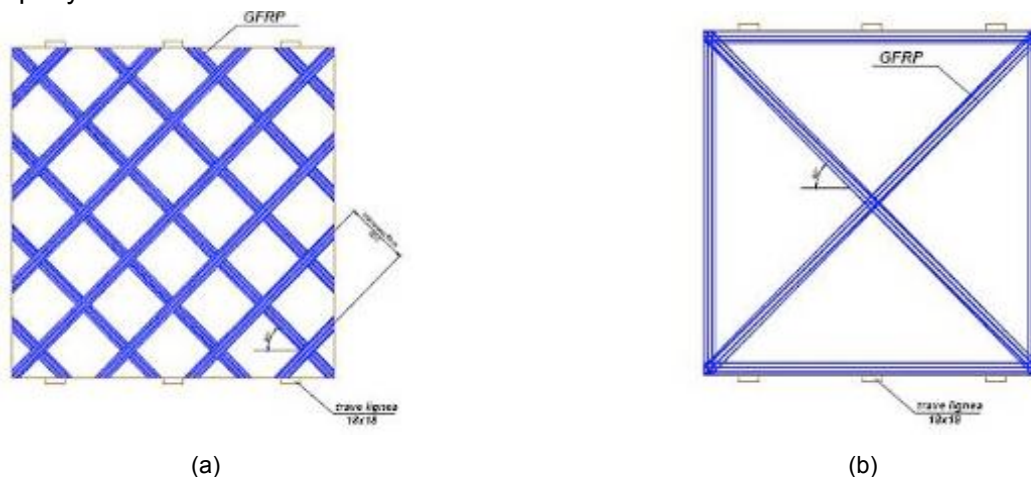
Layout of the GFRP reinforcements, (Borri 2004b).
